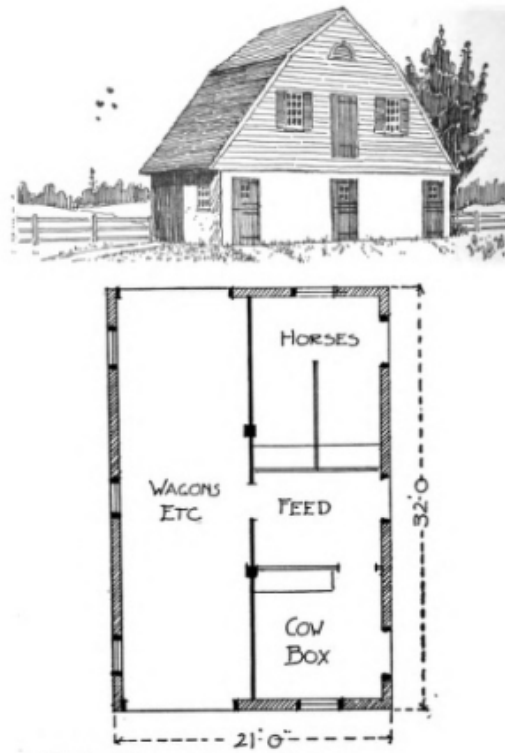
A drawing and floor plan of a small barn, quoted in Brinckloe, *The Small Home*, 210.
